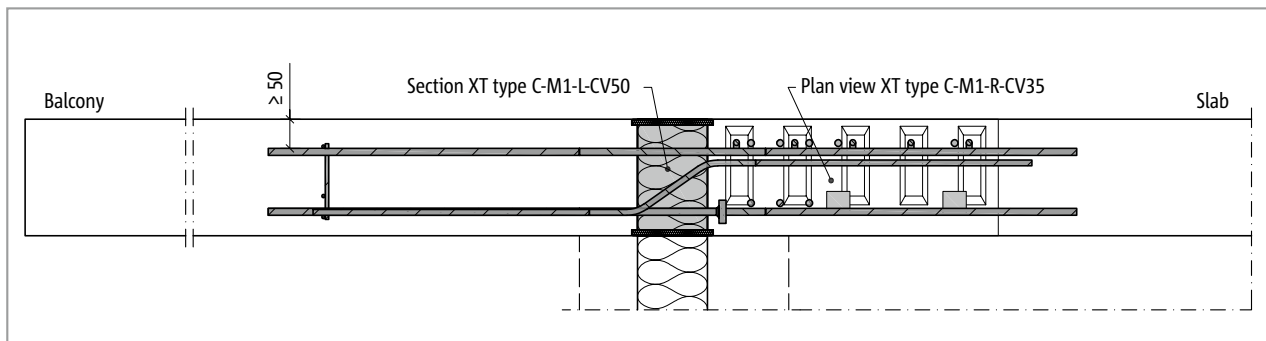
Schöck Isokorb® XT type C: Outer corner with non-load-bearing cavity wall masonry (view XT type C-M1-L-CV50; section XT type C-M1-R-CV35)
